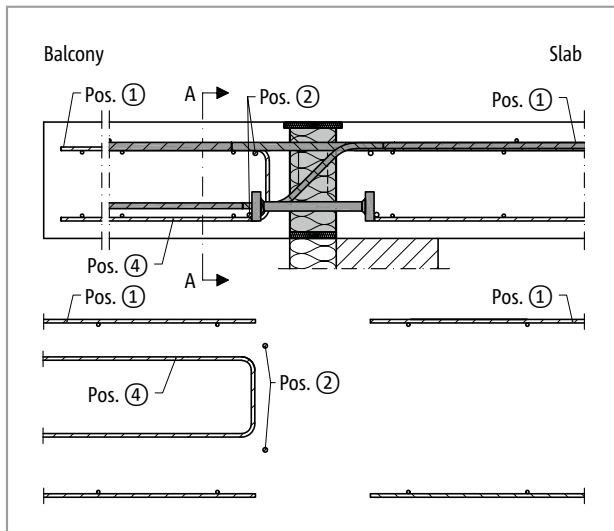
Schöck Isokorb® T type K-M12: On-site reinforcement with direct support
